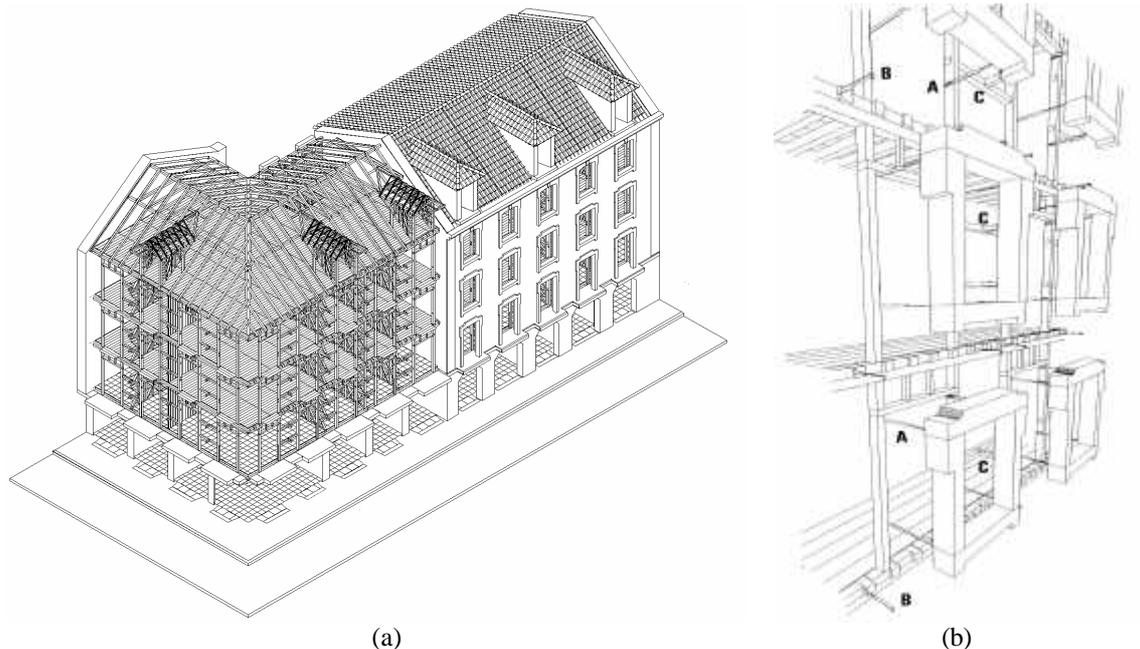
Aspects of the Pombaline construction: (a) building with the façade walls removed to show the timber bracing system; (b) detail of the timber frame and anchoring system to the main façade pilasters.
